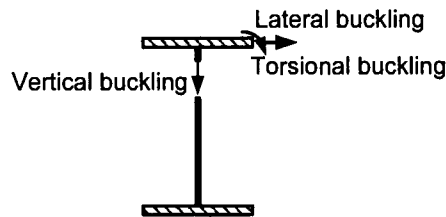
Possible buckling modes of I-Girder section Salmon and Johnson (1996)
